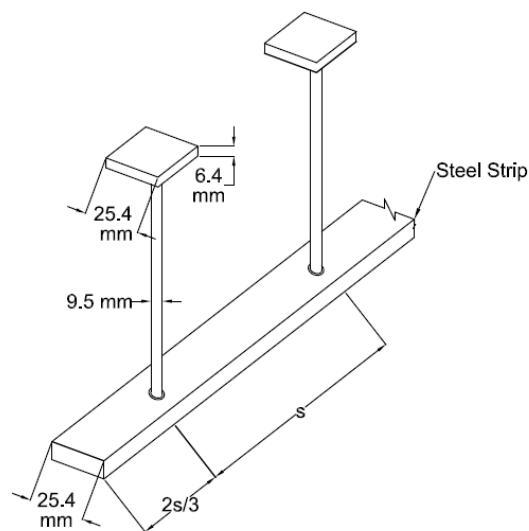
Details of the shear studs welding (figure after Mokhtar, Ghali, and Dilger, 1985)
